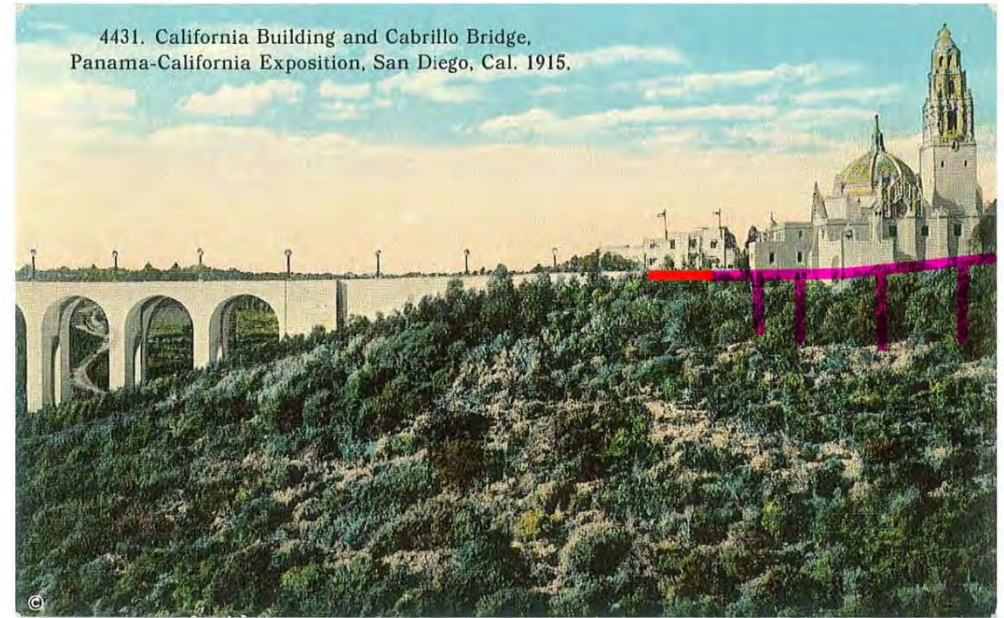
Same view showing the proposed Bypass Bridge and column supports in pink from Cabrillo Bridge to Alcazar Gardens. Goodhue's plan to depict the approach to a "fortified European town" is interrupted.
